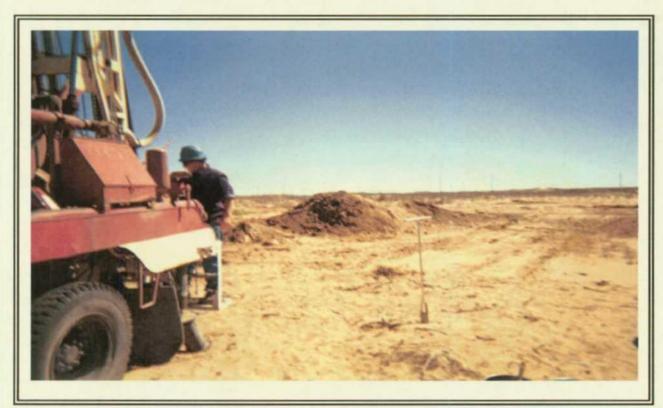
Drill Rig setting up on B-5. View is to the southeast.
